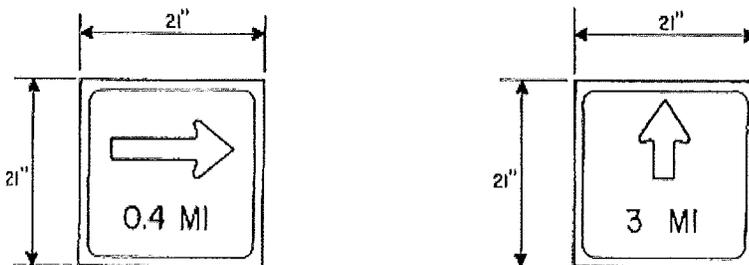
TYPICAL DIRECTION ARROW & MILEAGE DETAIL
